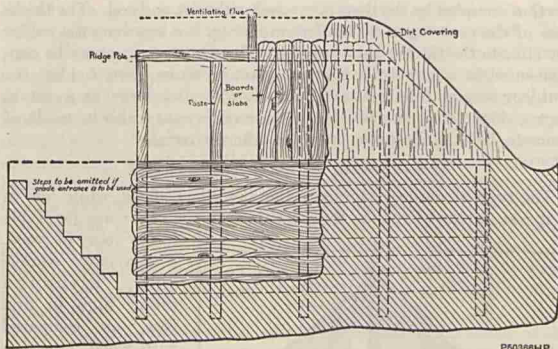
Side view of an outdoor storage cellar, showing the details of construction. If the cellar is more than 12 feet long, two ventilating flues should be used. If built on a sidehill, no steps will be needed, making it easier to store and remove the vegetables.
